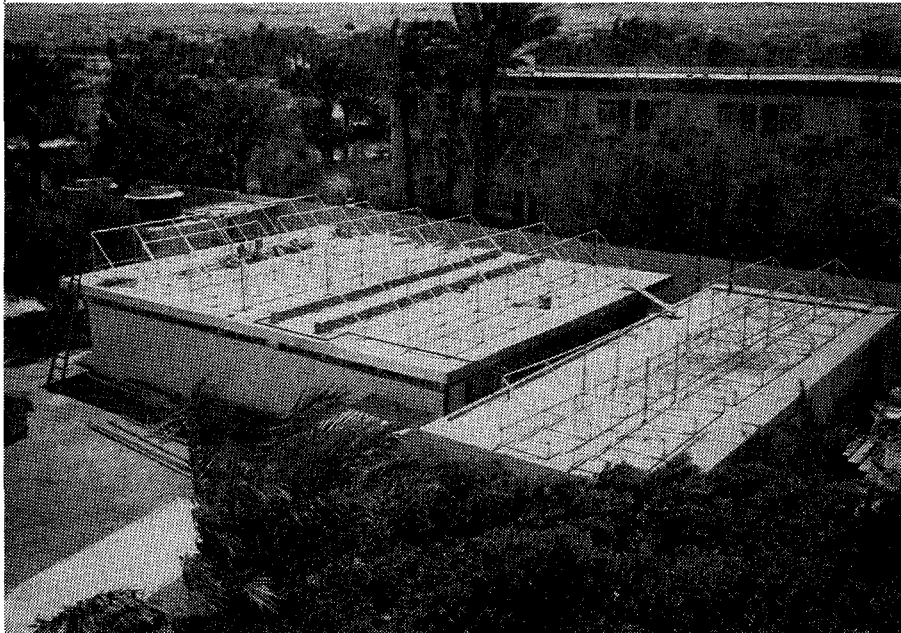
Photograph of racks after welding and putting in place.
